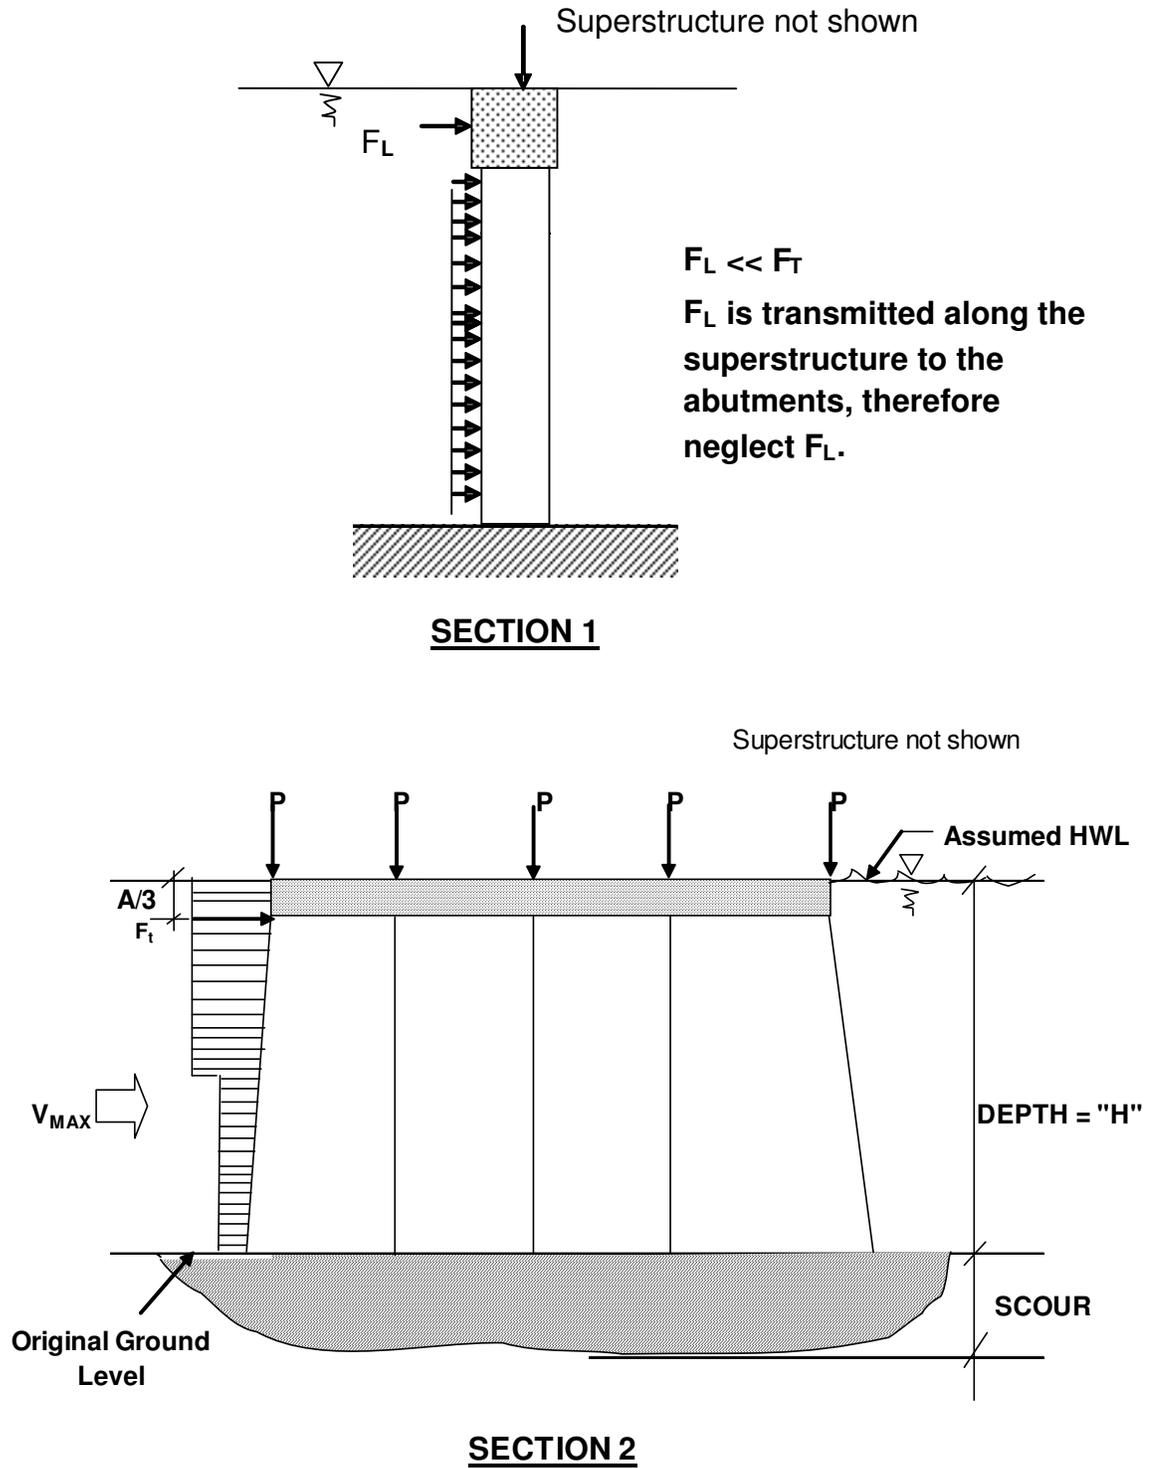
Sections Showing Longitudinal And Transverse Flood Water Loading on Bent (see Fig. 2.6)
